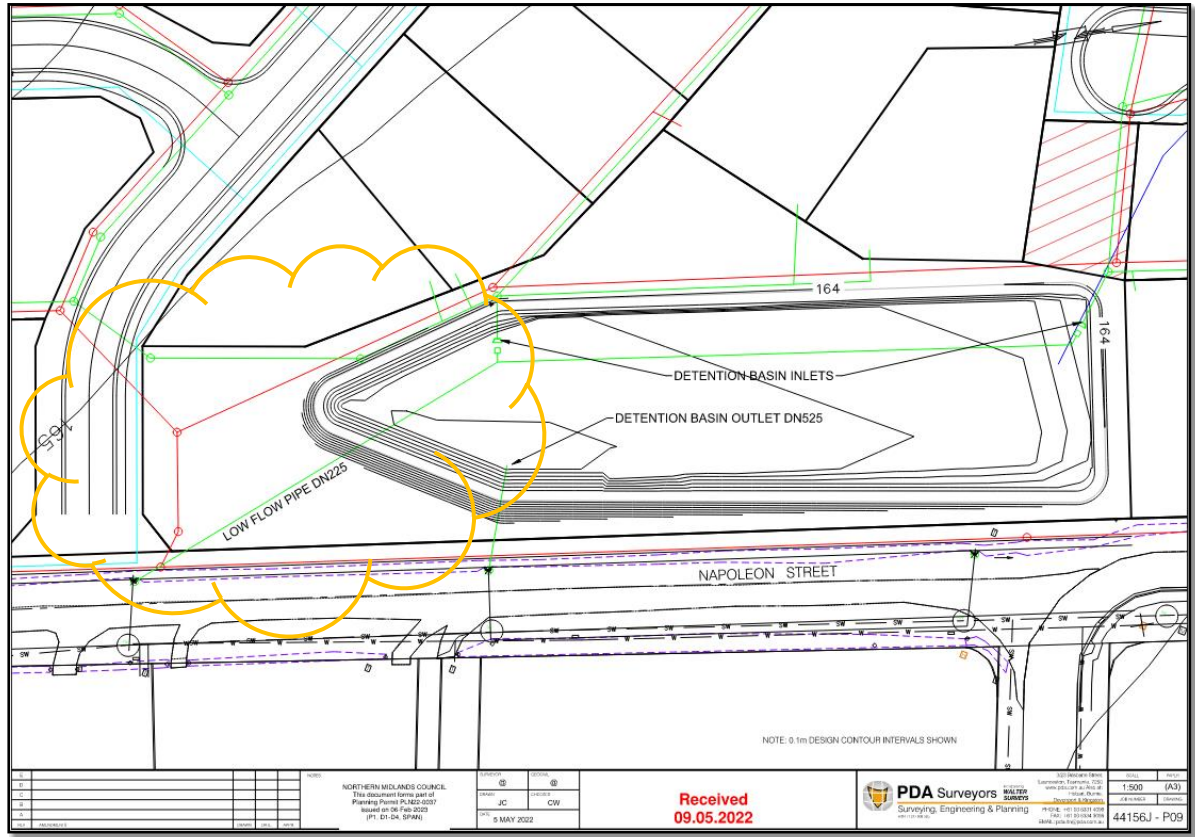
Detention basin stormwater pipework, showing low flow pipe bypass separate to basin outlet
